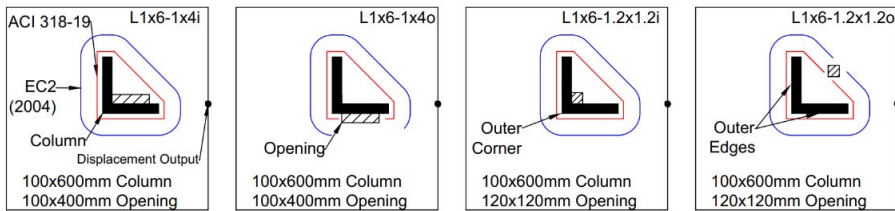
Slab-column specimens studied and critical perimeters used to calculate capacities according to ACI 318-19 [5] and Eurocode 2 [6] (specimen without opening, L1x6-0 not shown). *Source:* own study
